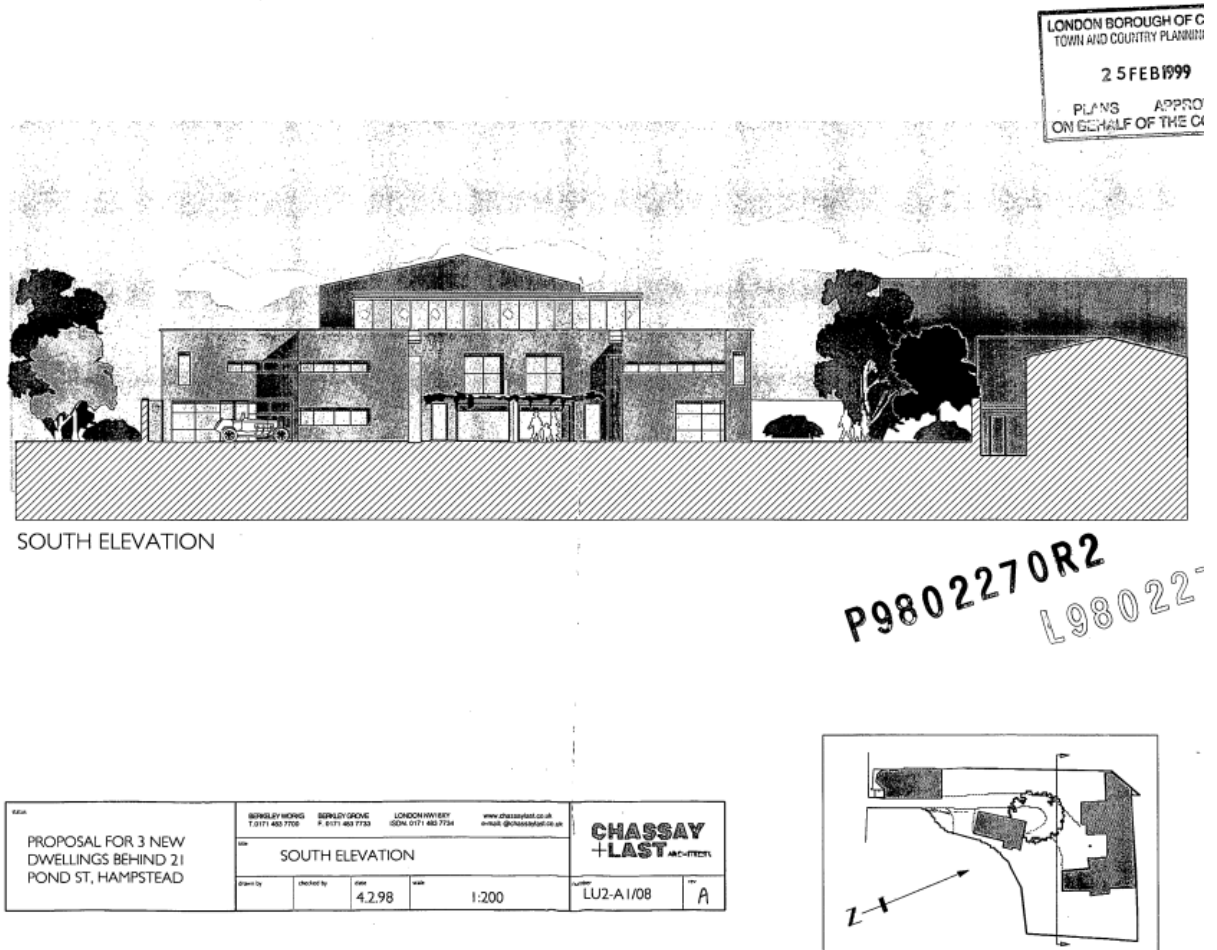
21 Pond Street (South Elevation). Source: LPA Ref. PW9802270R2, "Drawing".
